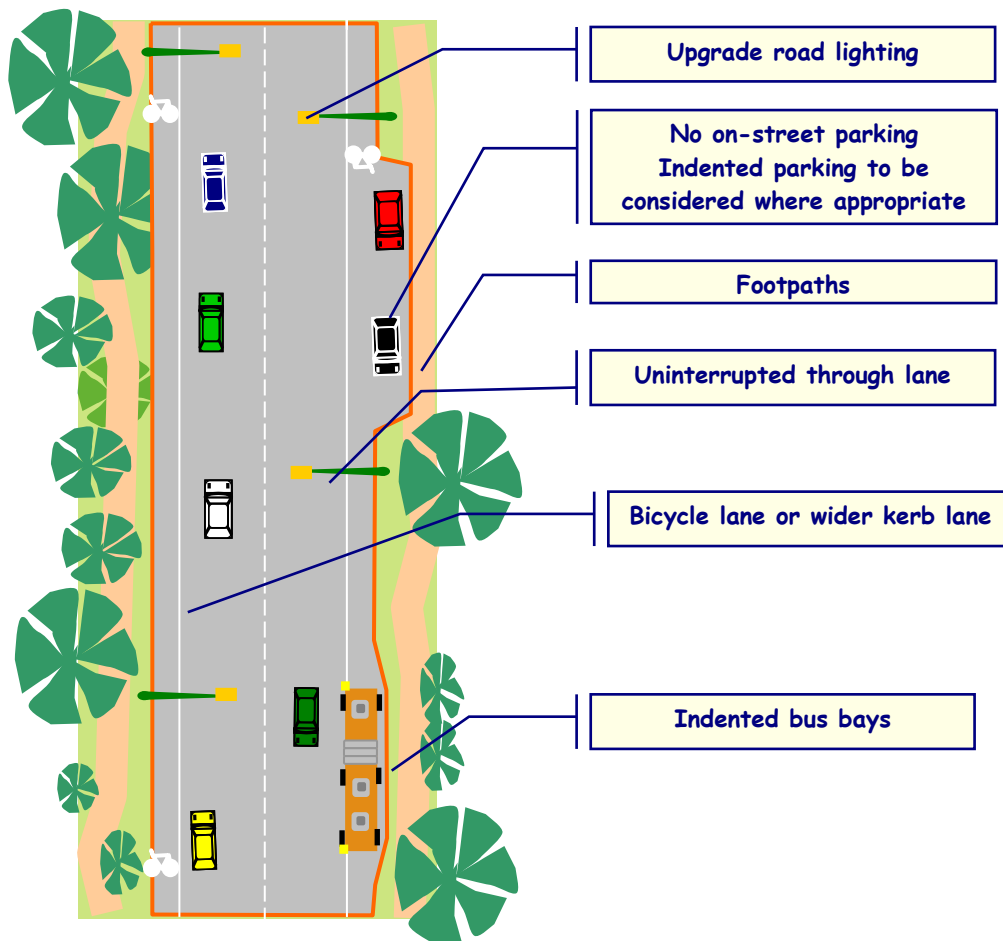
Typical Mid-block Cross-section for Sections 1 and 2
